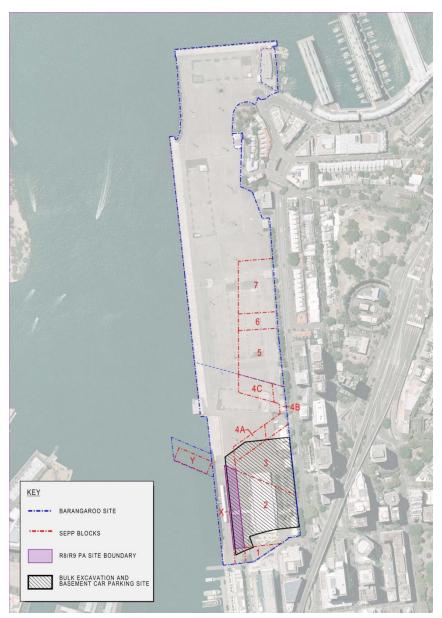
R8 and R9 Residential Building Project Application (MP11_0002) Aerial Site Location Plan
